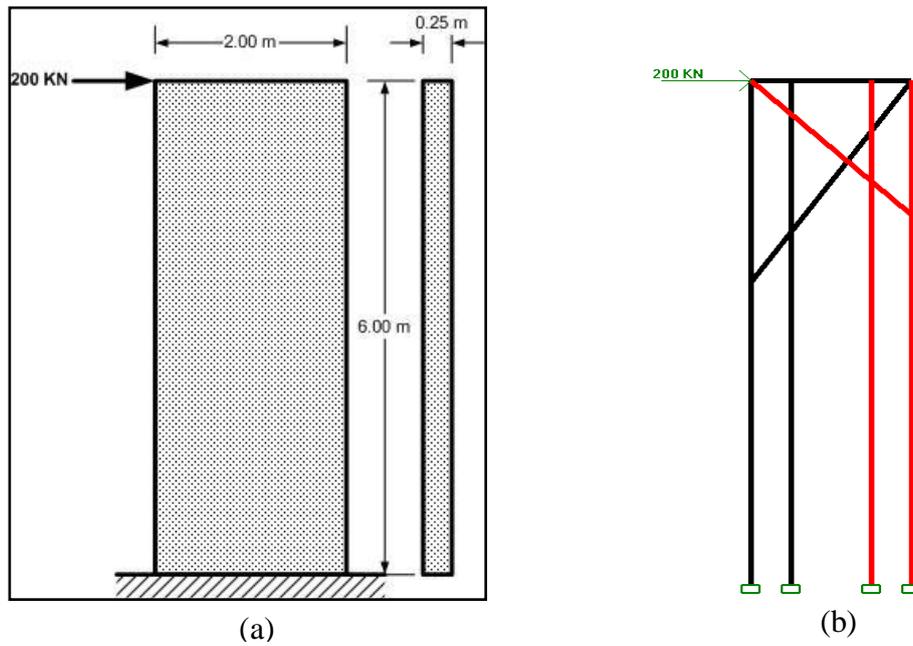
(a) Single plane shear wall under single point horizontal loading, (b) Configuration of the extracted strut and tie model
